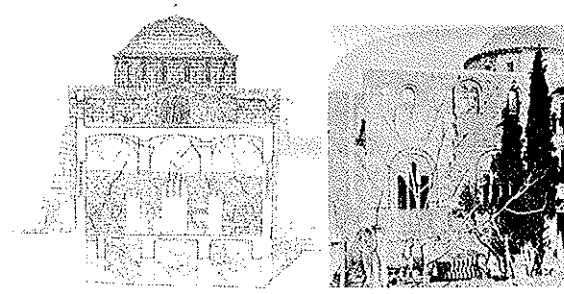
N-S transversal section in the narthex. The south wall, although reconstructed in 1896 (see photo), presents today a 90 mm out-of-plane deformation.
